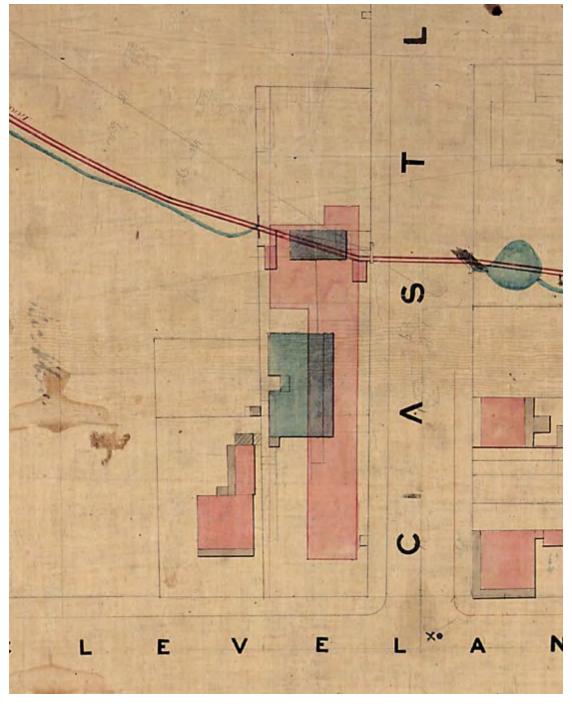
CLEVELAND STREET SCHOOL, 1865. THE ORIGINAL IRON BUILDINGS ARE SHOWN IN BLUE ON THIS PLAN. WHEN THE PLAN WAS UPDATED, THE NEW BRICK SCHOOL WAS SHOWN SUPERIMPOSED OVER THE OLD BUILDINGS. NOTE THE METHODIST MANSE TO THE WEST, PLUS THE SEWER RUNNING UNDER THE ORIGINAL TOILET BLOCK ON THE NORTHERN PART OF THE SITE. Source: Trig Survey of Sydney, 1865, Sheet S1
